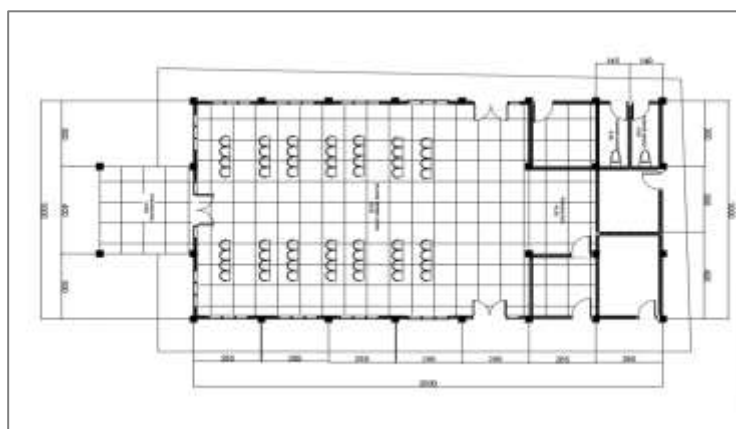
Existing Floor Plan of Petompon Sub-district Hall, Semarang City
